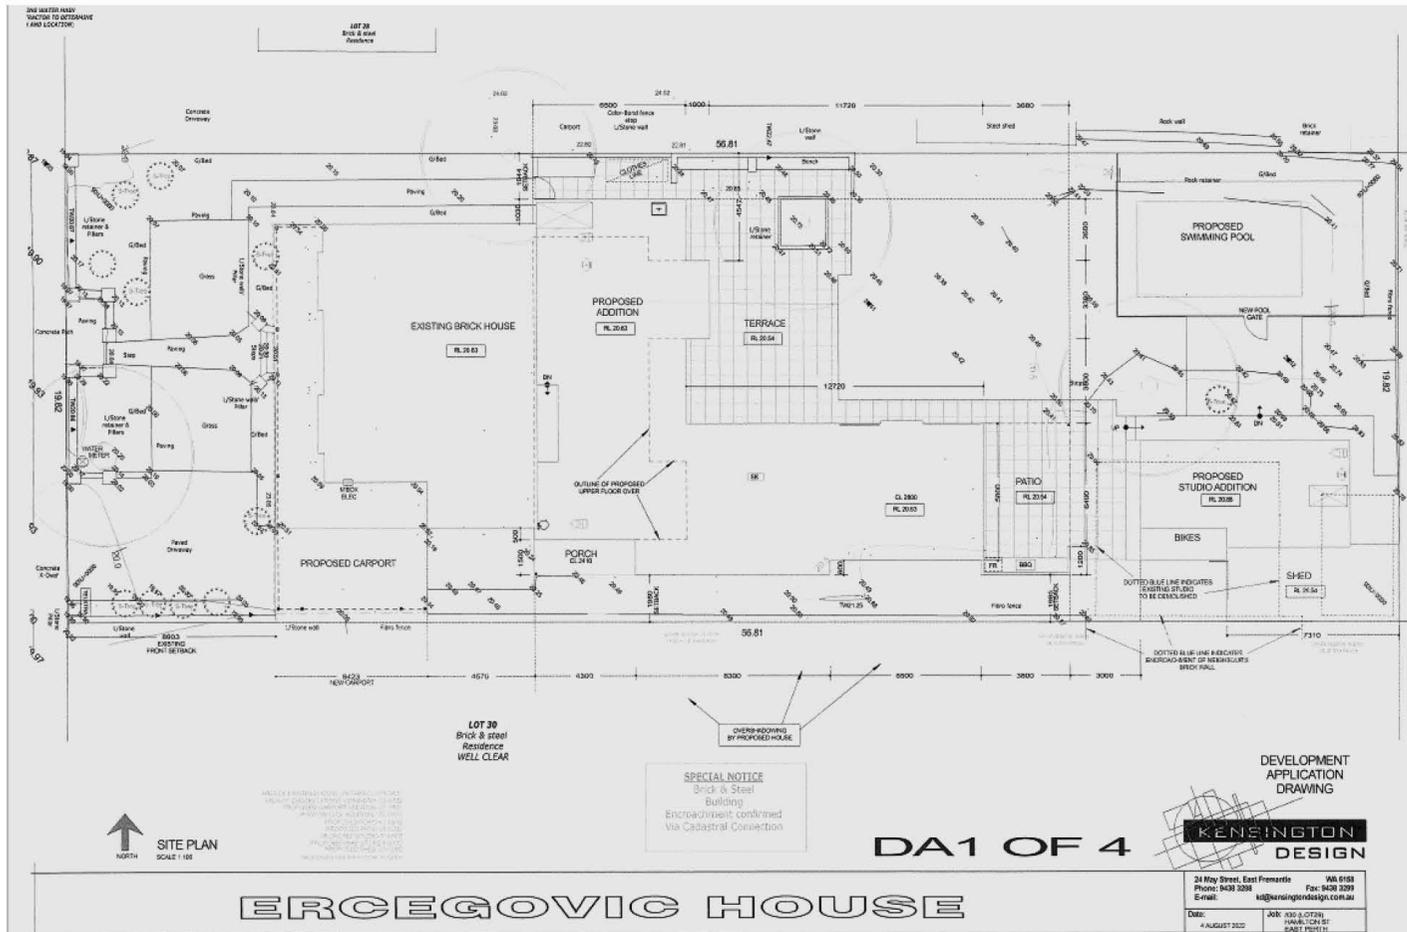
Site plan showing location of new additions. Courtesy Kensington Design
